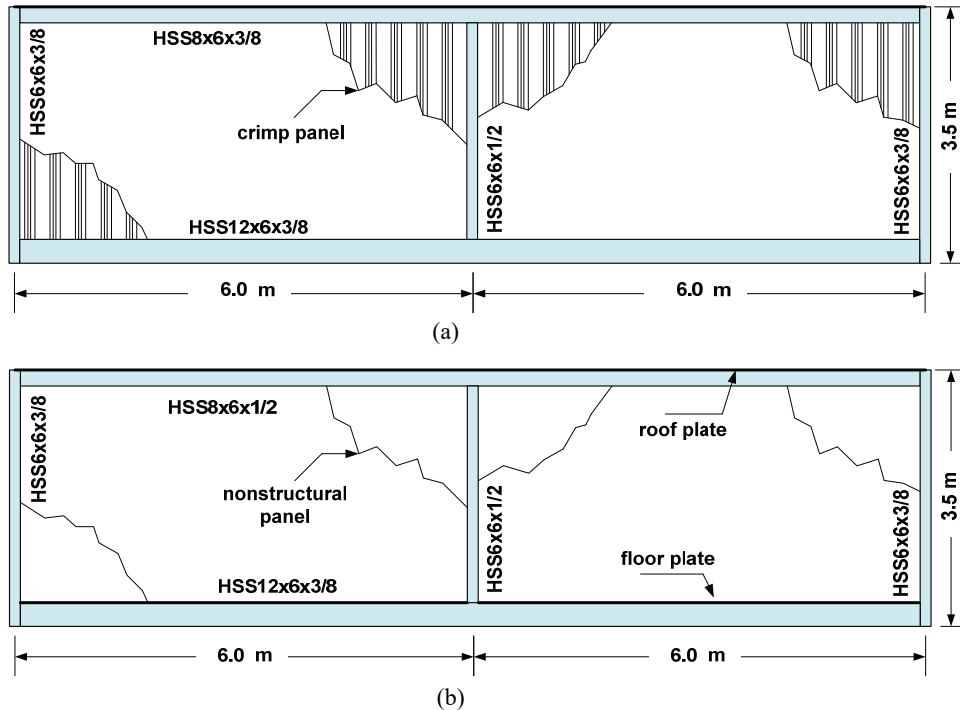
Prototype building elevation views at (a) column axes A and C (b) column axis B
